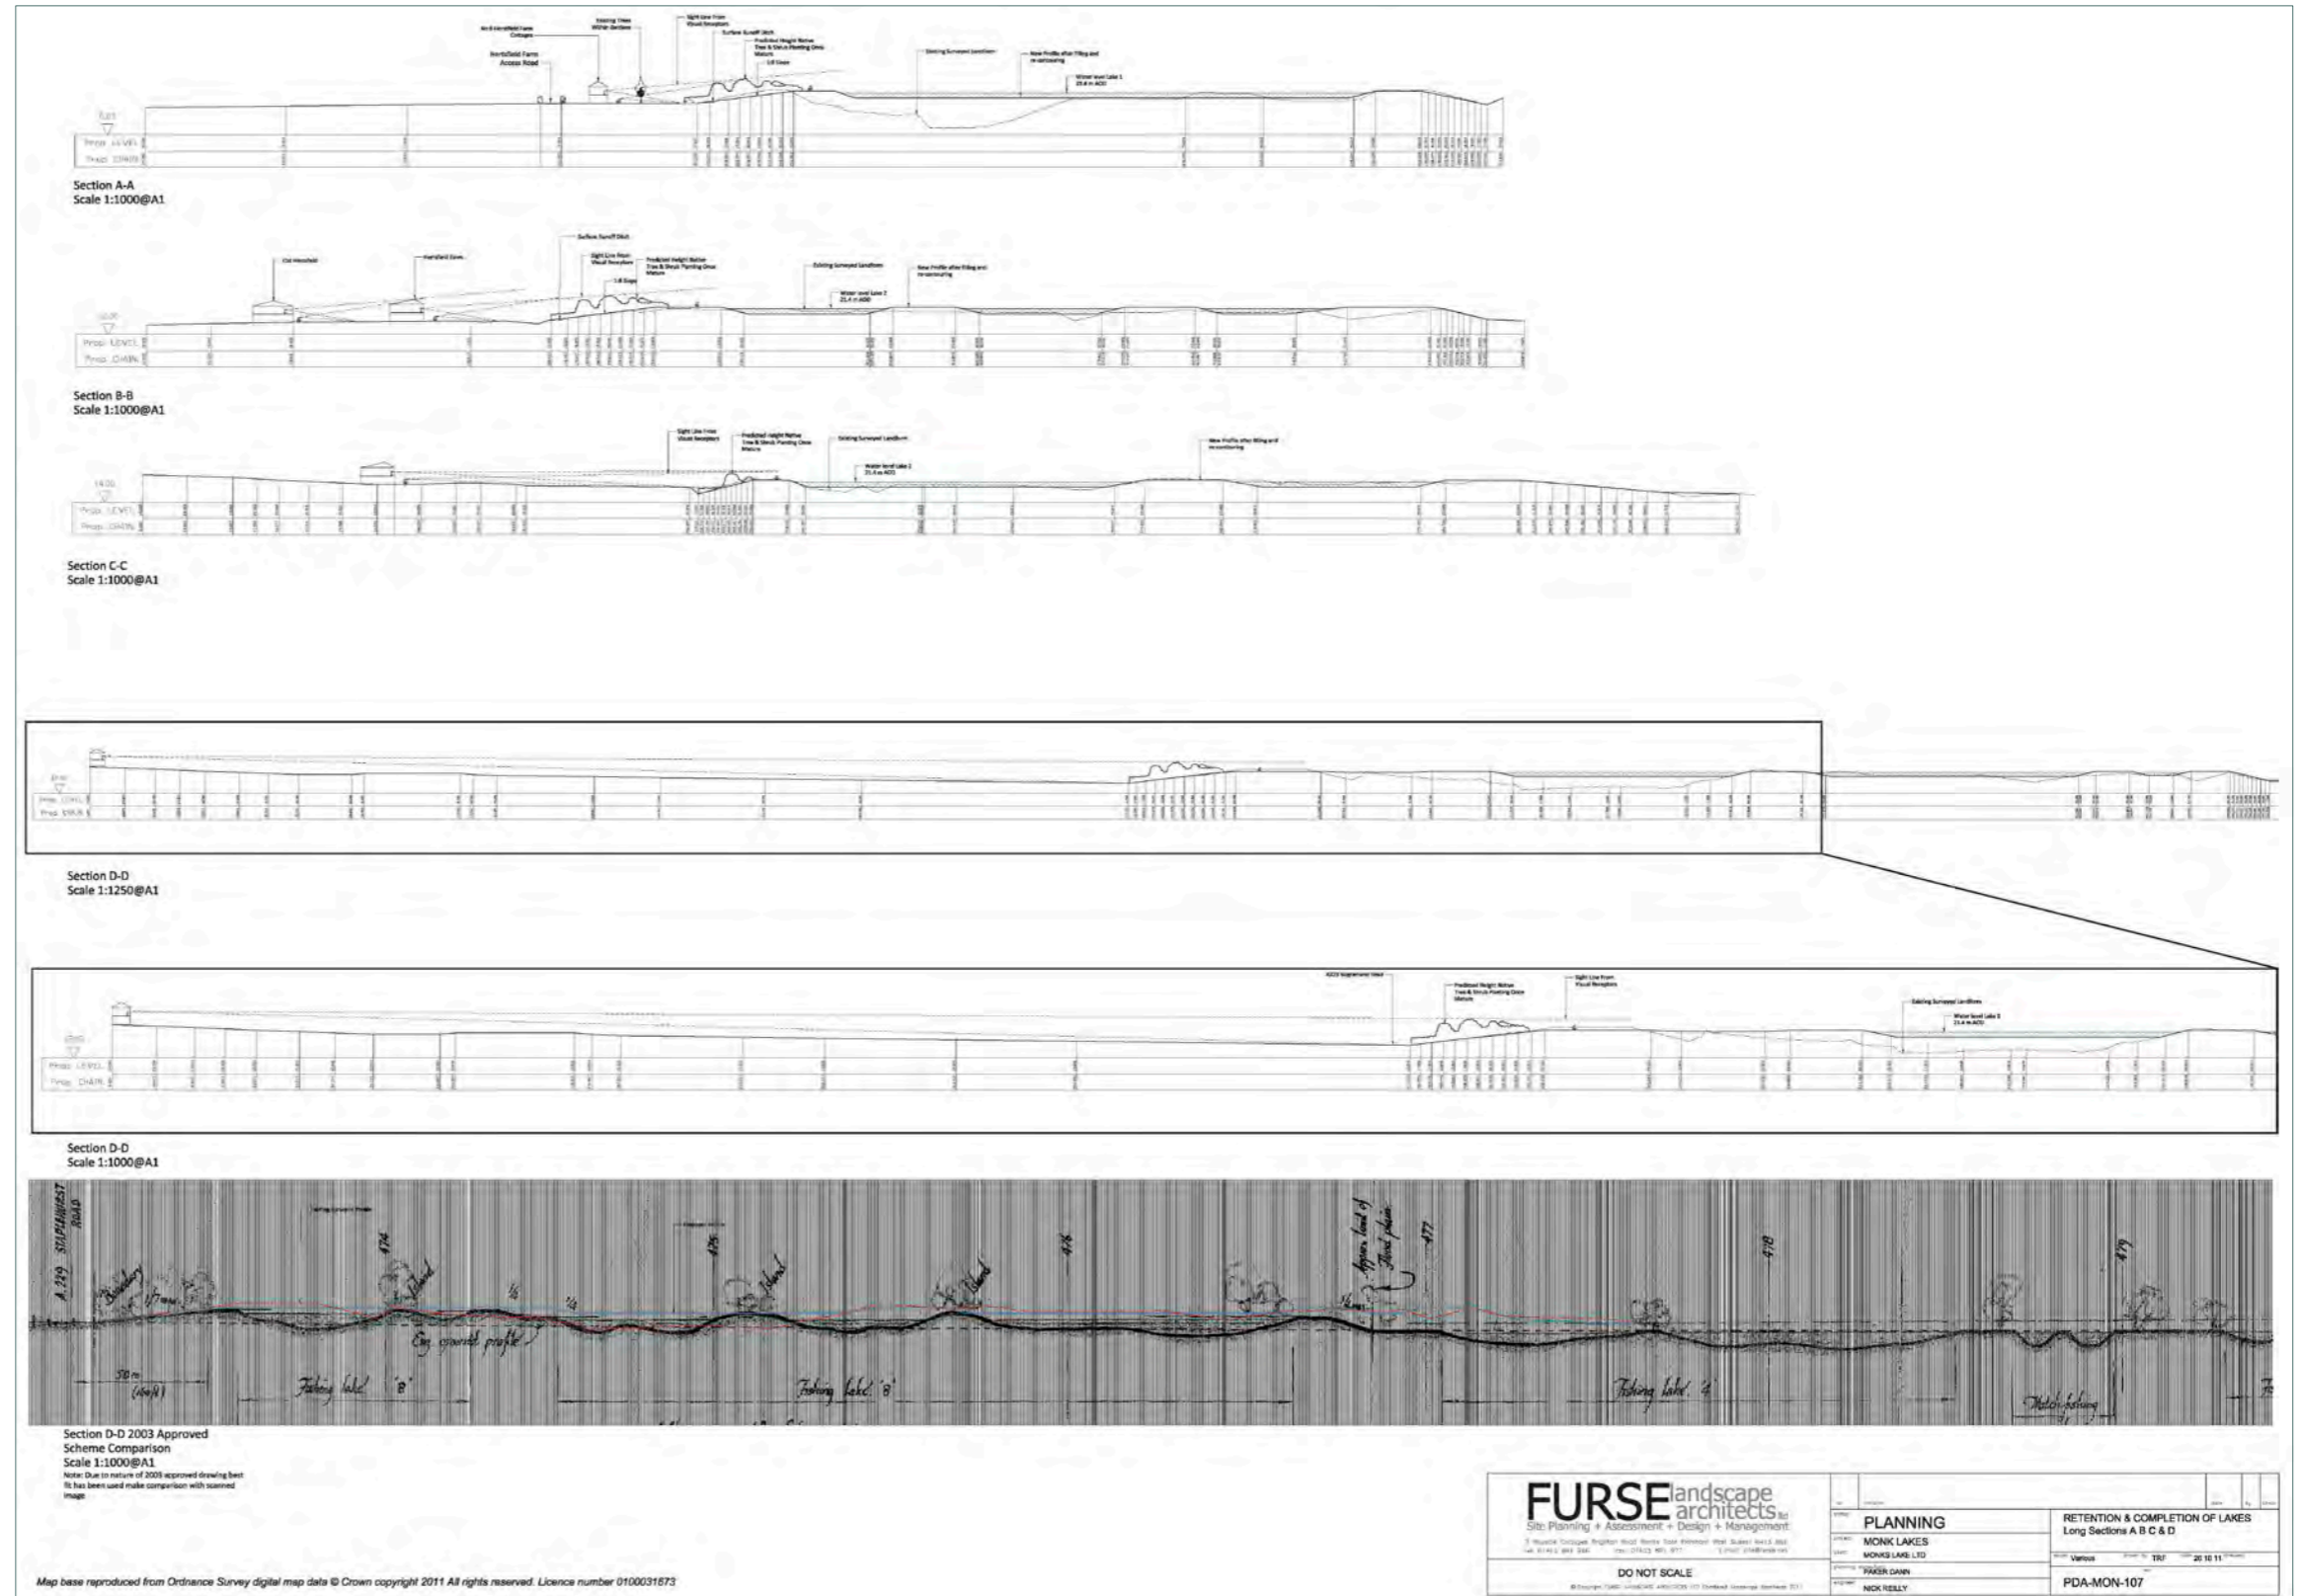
showing Proposed Sections (FURSE Landscape Architects 2011)
